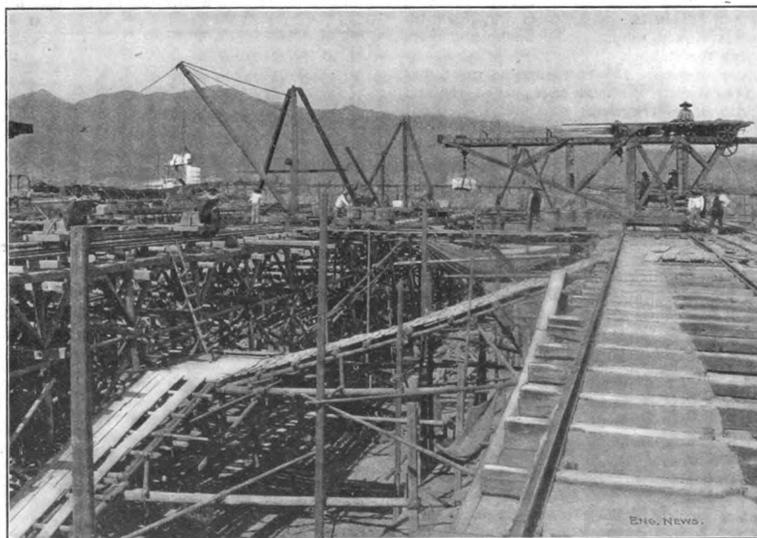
VIEW SHOWING STAGING AND PLANT FOR LAYING THE STONE FACING.
